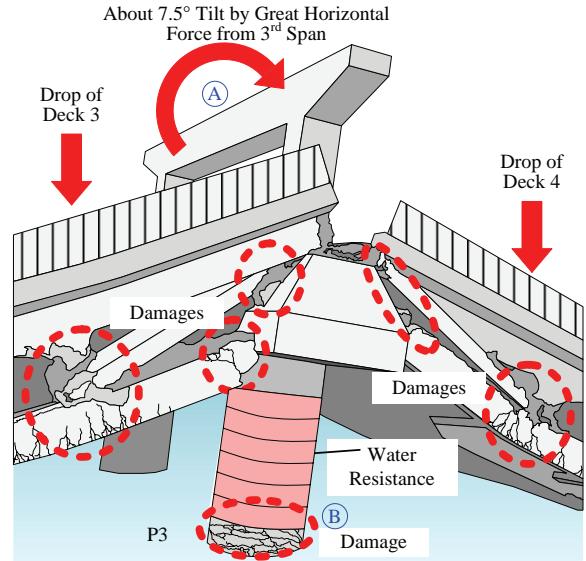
Failure Condition of Pier 3 (upstream)
